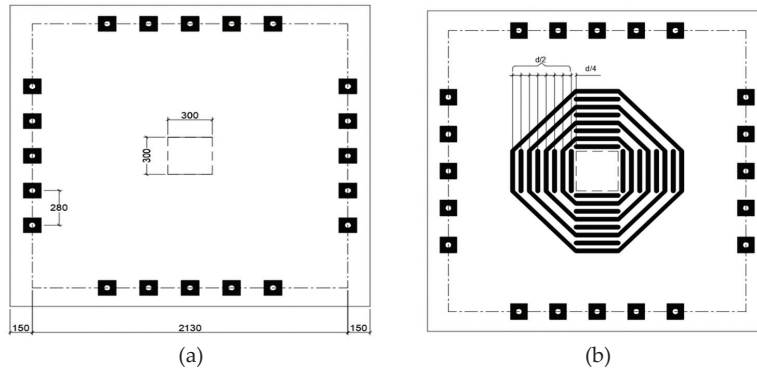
(a) Specimen dimensions, column dimensions, and locations of perimeter loading points and (b) 8 CFRP rows around loading column [40].
